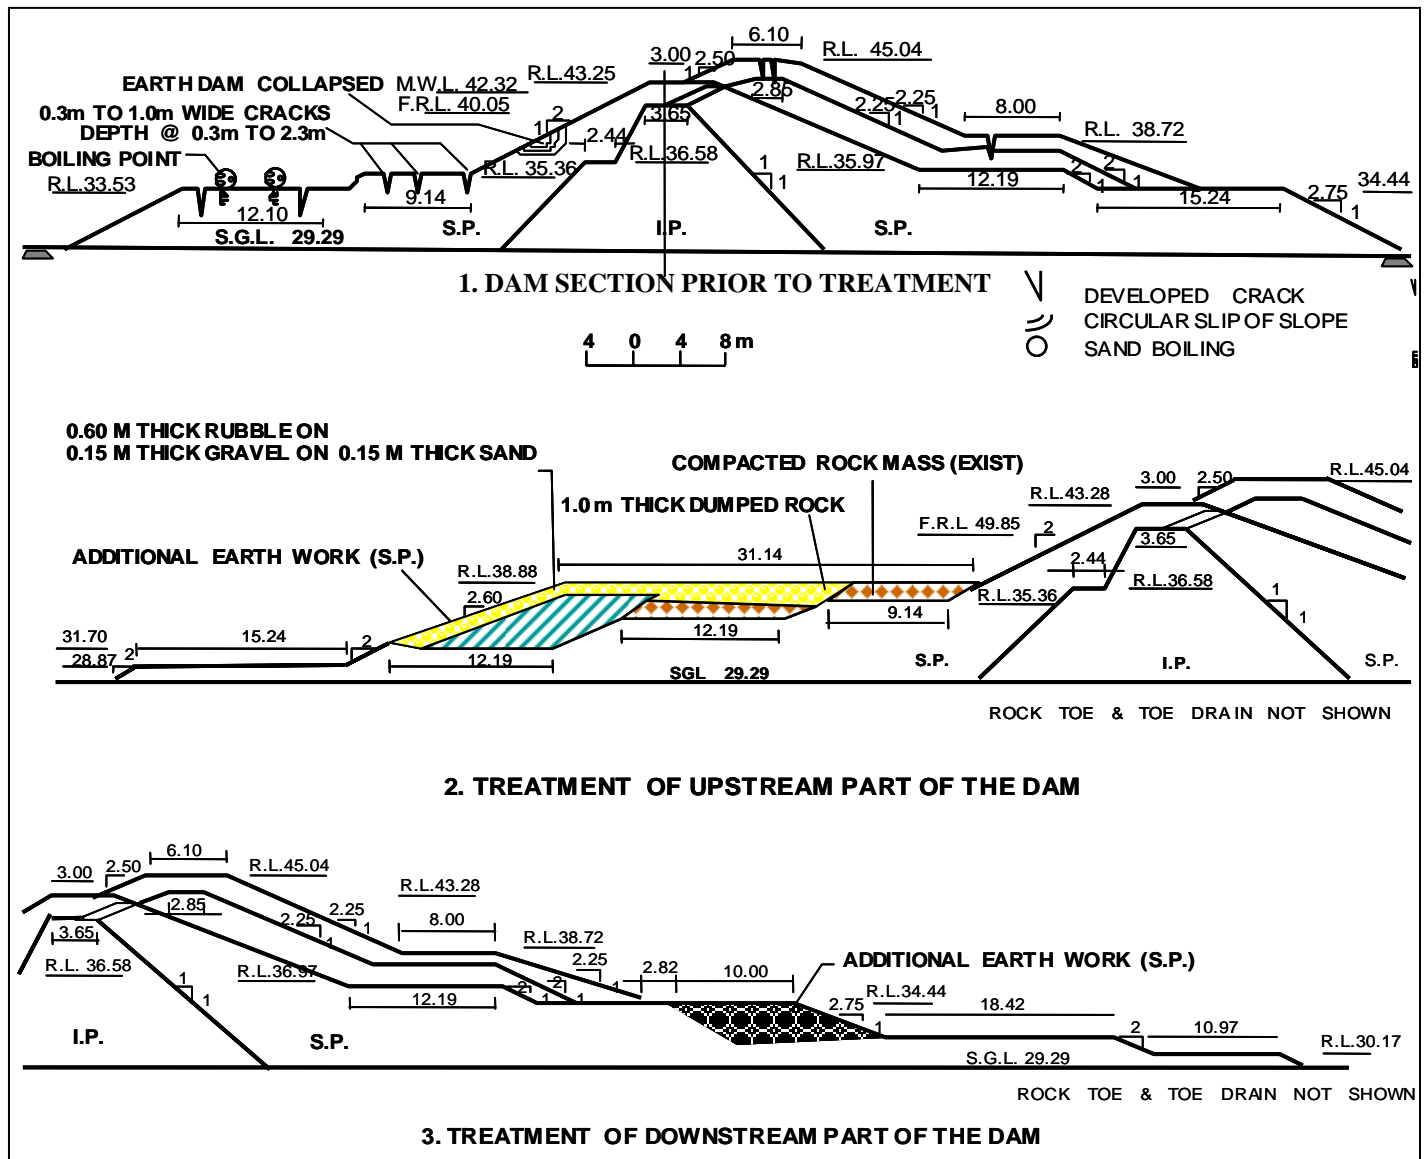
Sections of Tapar earth dam showing damage pattern and post earthquake treatment
